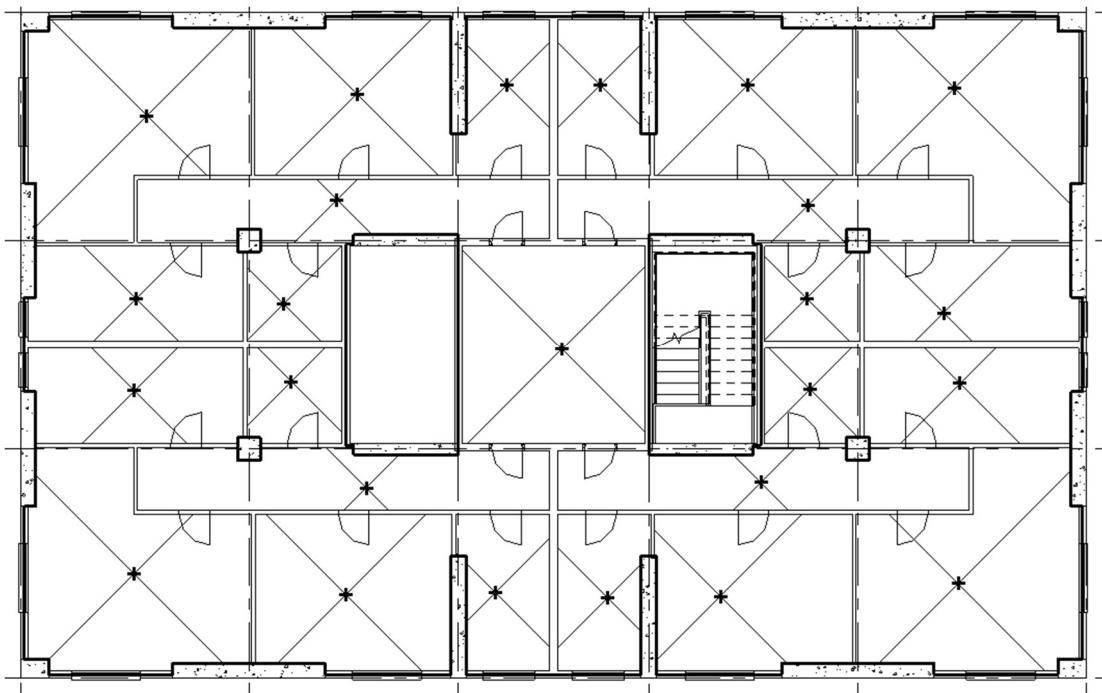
The layout of reinforced concrete system with shear wall prototype 1
